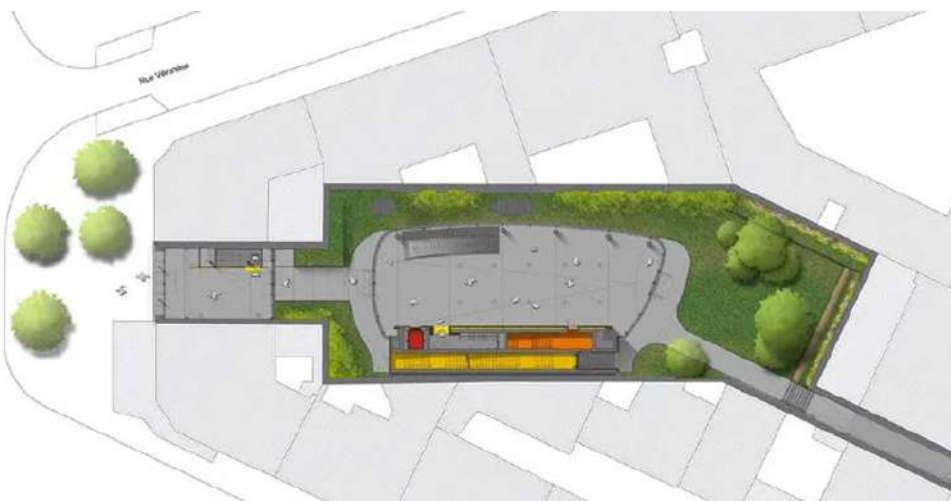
Pathe Foundation, Renzo Piano, Paris, France: Ground Floor (2)
